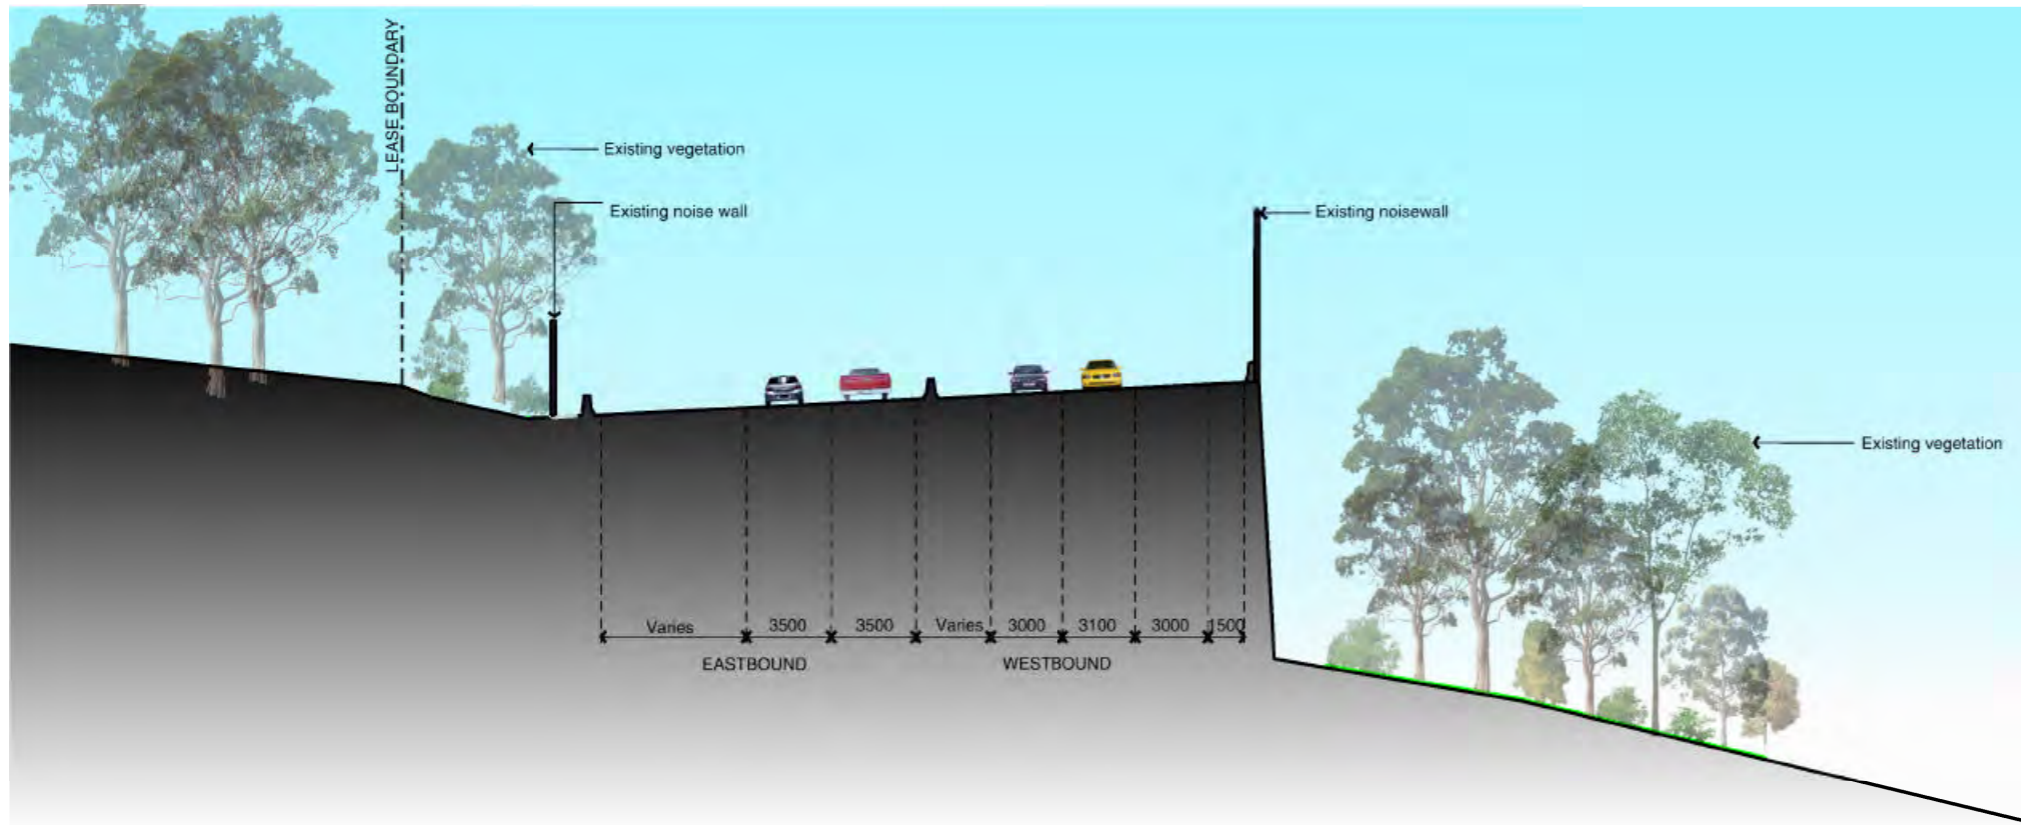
Stn 13600 Somerset Street east - Existing
